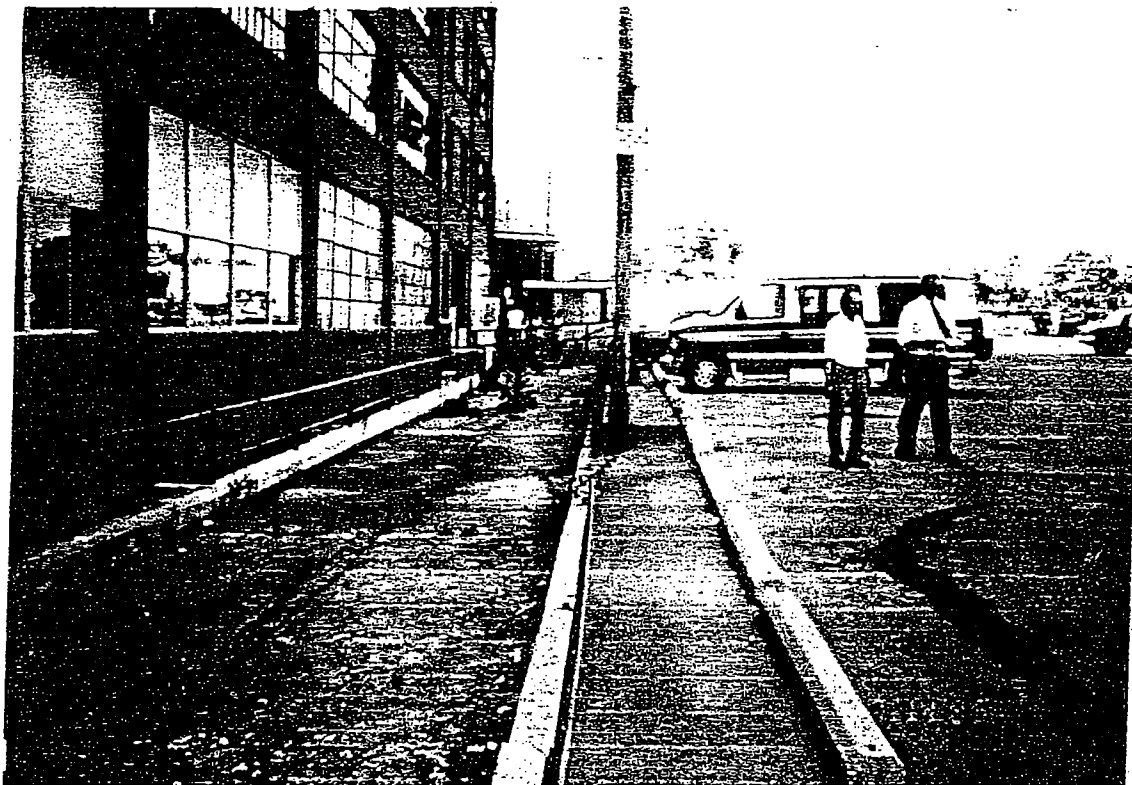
PHOTO TAKEN ALONG WEST SIDE OF BUILDING LOOKING SOUTH. A PUMP ISLAND & UST WAS ONCE LOCATED IN THIS AREA
